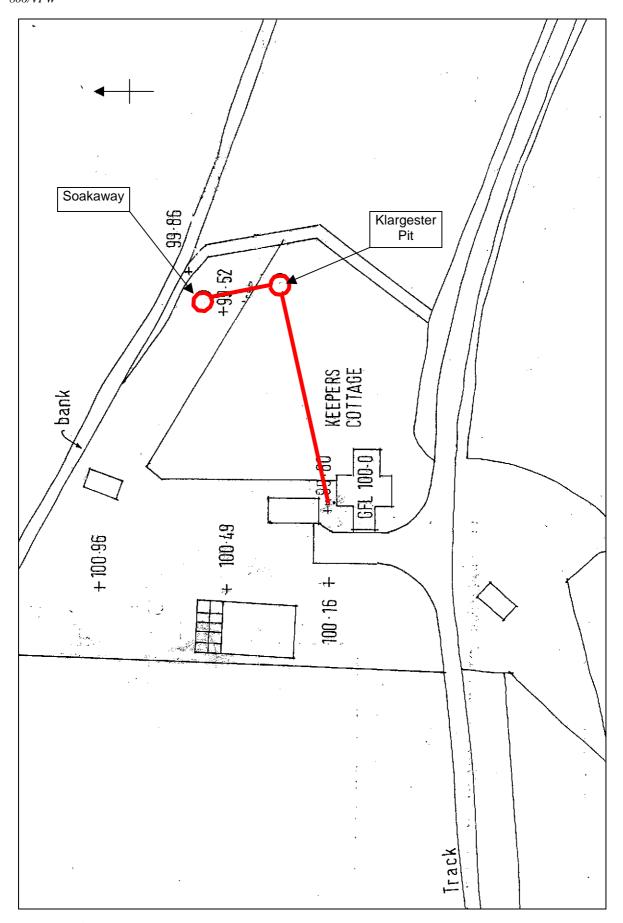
Site plan showing proposed route of sewage plant (scale 1:500)
